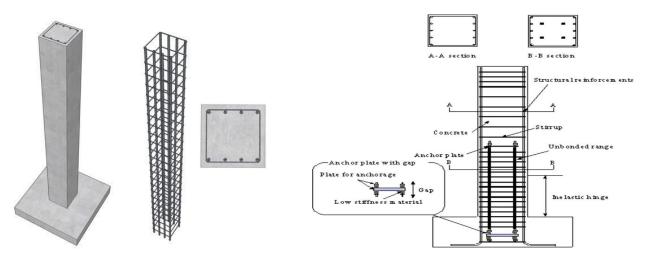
Reinforced concrete column (Elwood, K.J.,& Eberhard, M.O., 2009)
